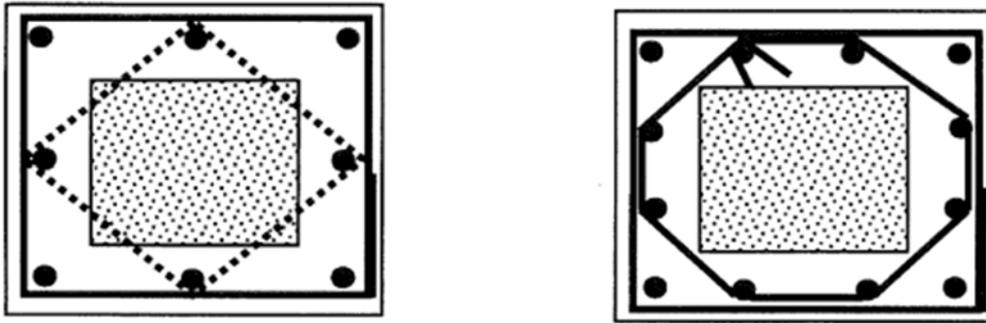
Placements of Internal Stirrups in Rectangular Cross Section
